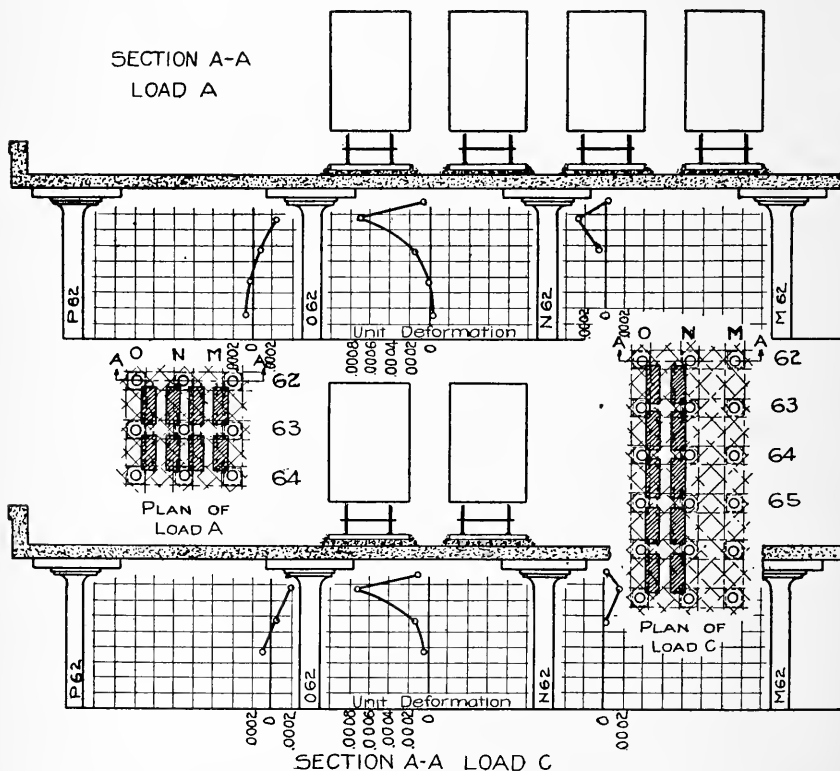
DEFORMATION IN COLUMNS CUT BY SECTION A-A (NORMAL TO TRACKS) OF SOO TERMINAL STRUCTURE.
